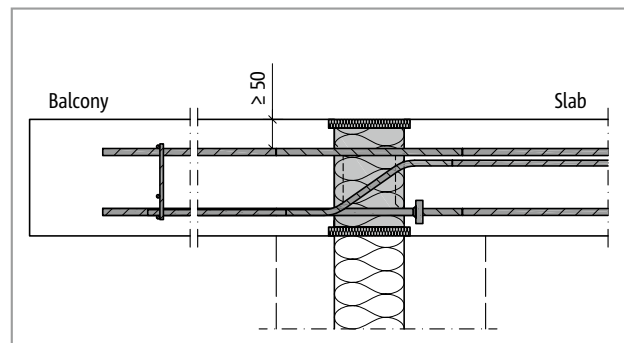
Schöck Isokorb® XT type C-CV50: Connection with non-load-bearing cavity wall masonry
